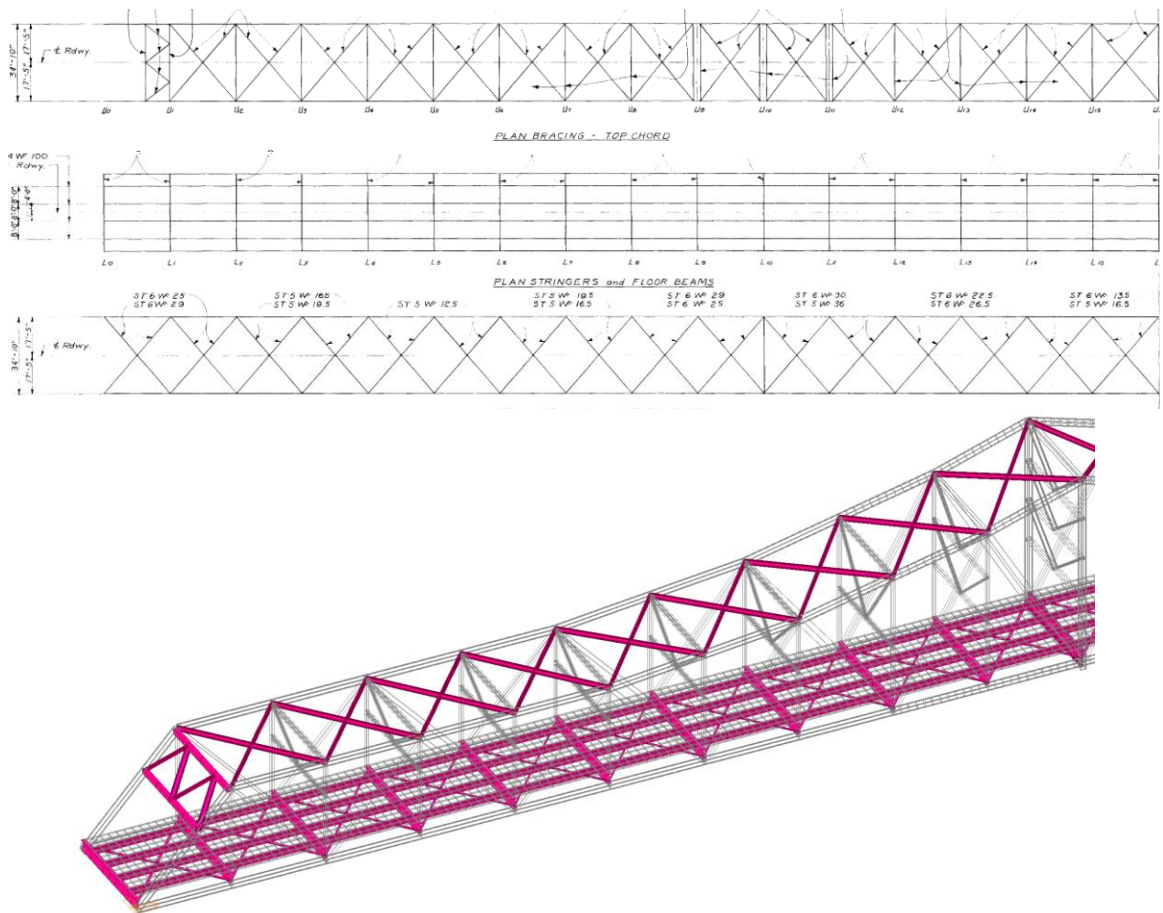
View of top and bottom lateral bracing, stringer–floorbeam system: technical drawing (top) and FE model (bottom) - Truss_1
